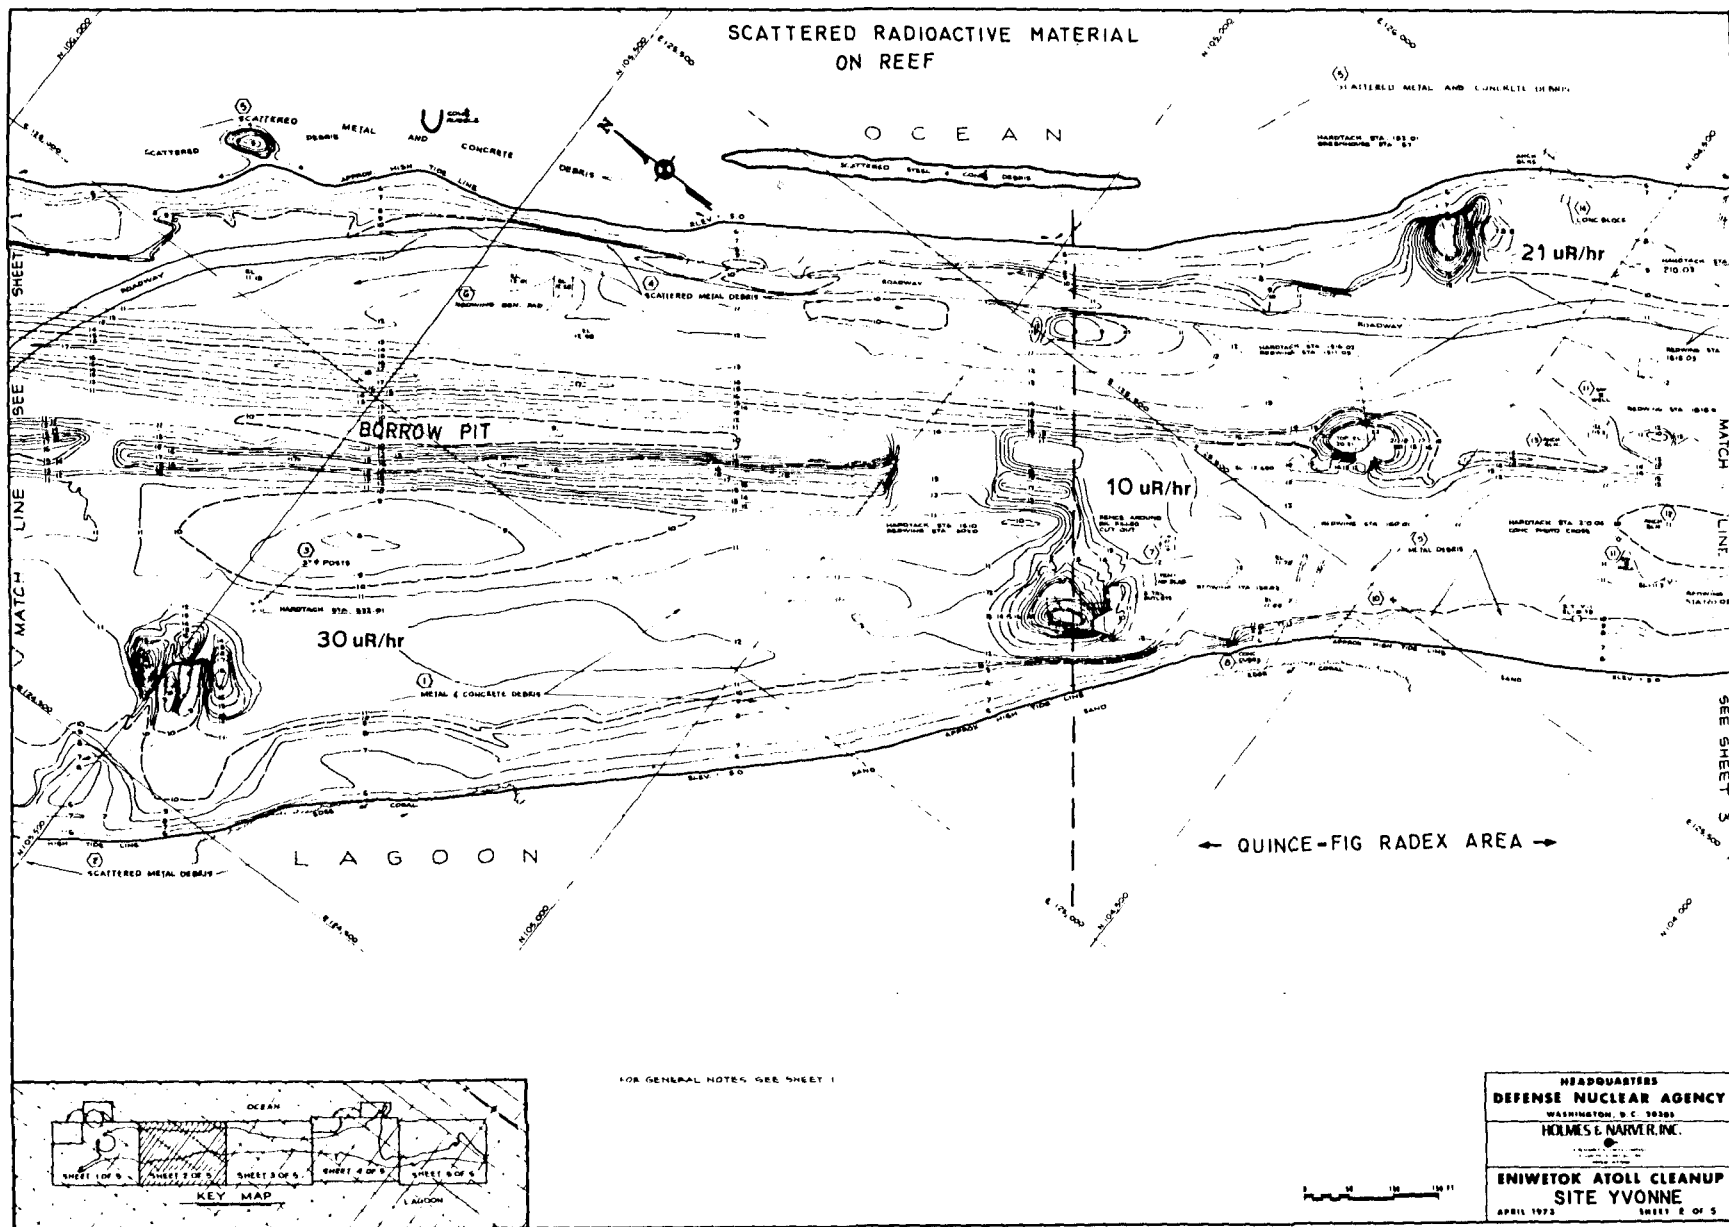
SITE YVONNE, SHEET 2 OF 5
